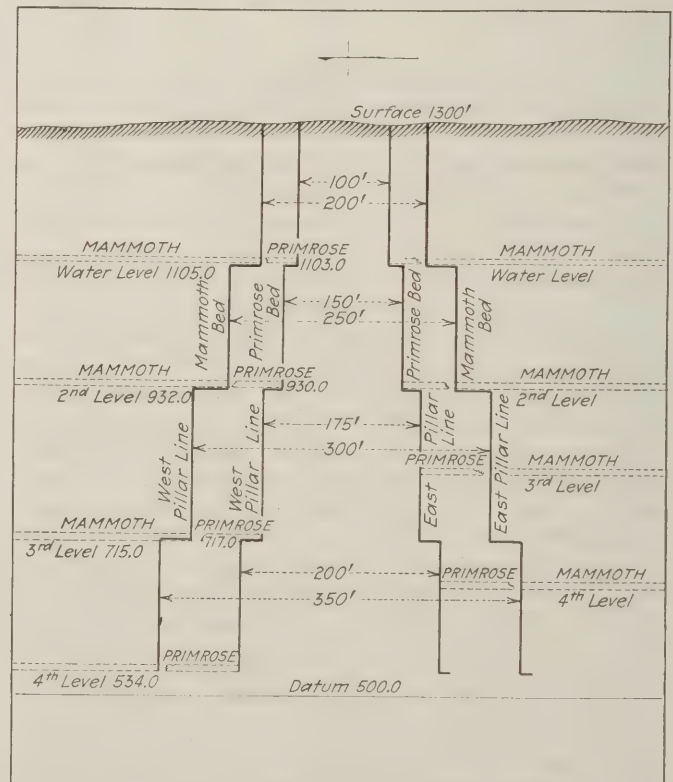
LONGITUDINAL SECTION OF A BARRIER PILLAR OF VARYING WIDTH
